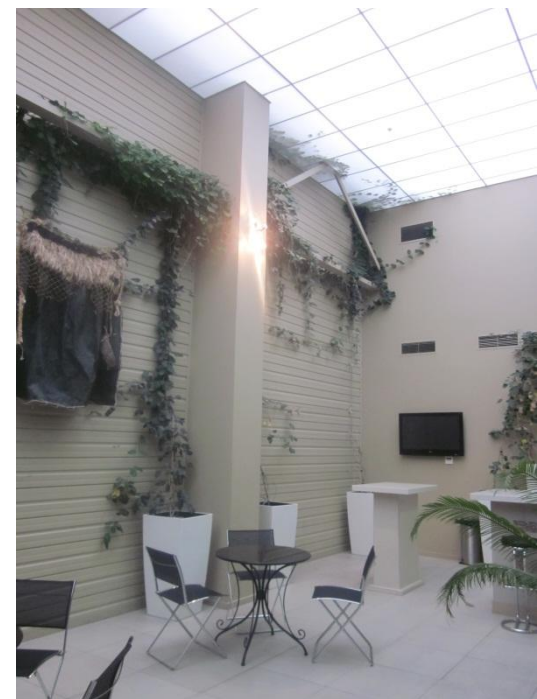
Existing Wall Bracing to Part 1 Continued – East Wall
